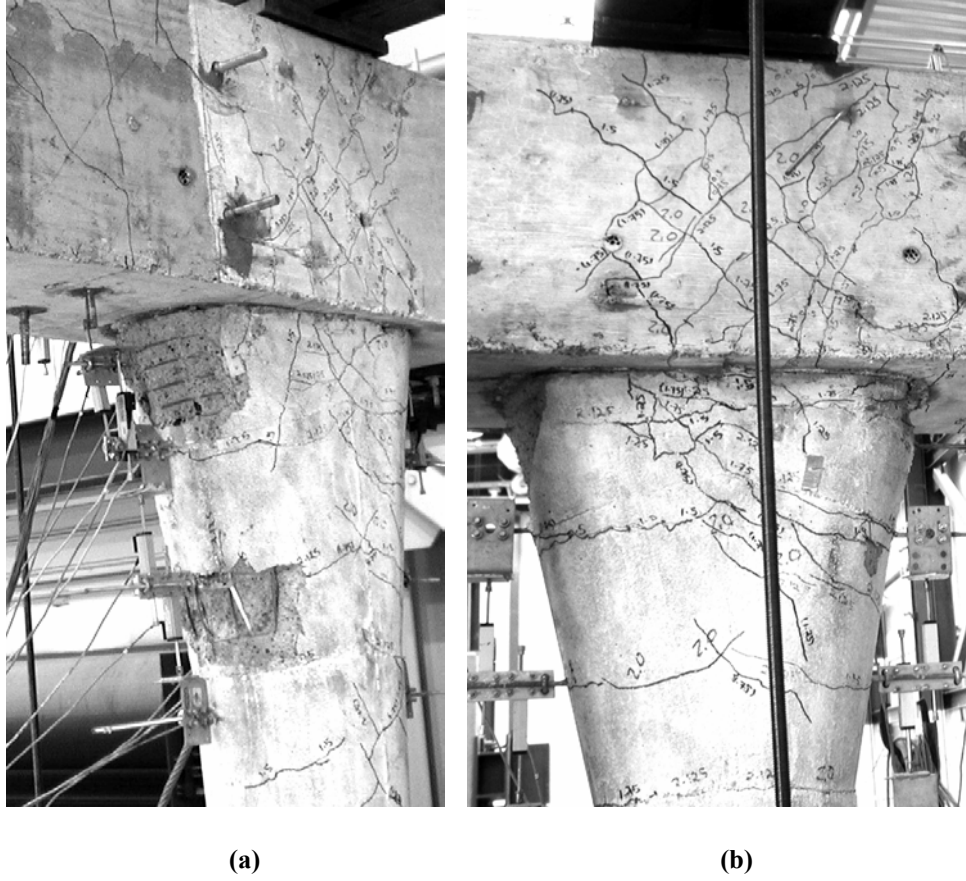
LFC1 after Bucket Removal (a) Concrete Spalling (b) Column and joint Cracks
